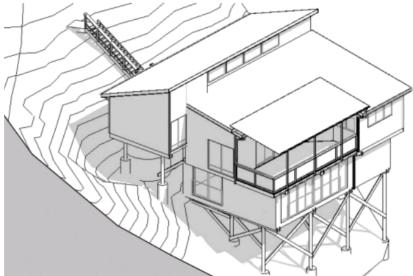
Figure B: North-east elevational drawing of proposed dwelling after improvements (Source: Concept Architects, 6 December 2021)
